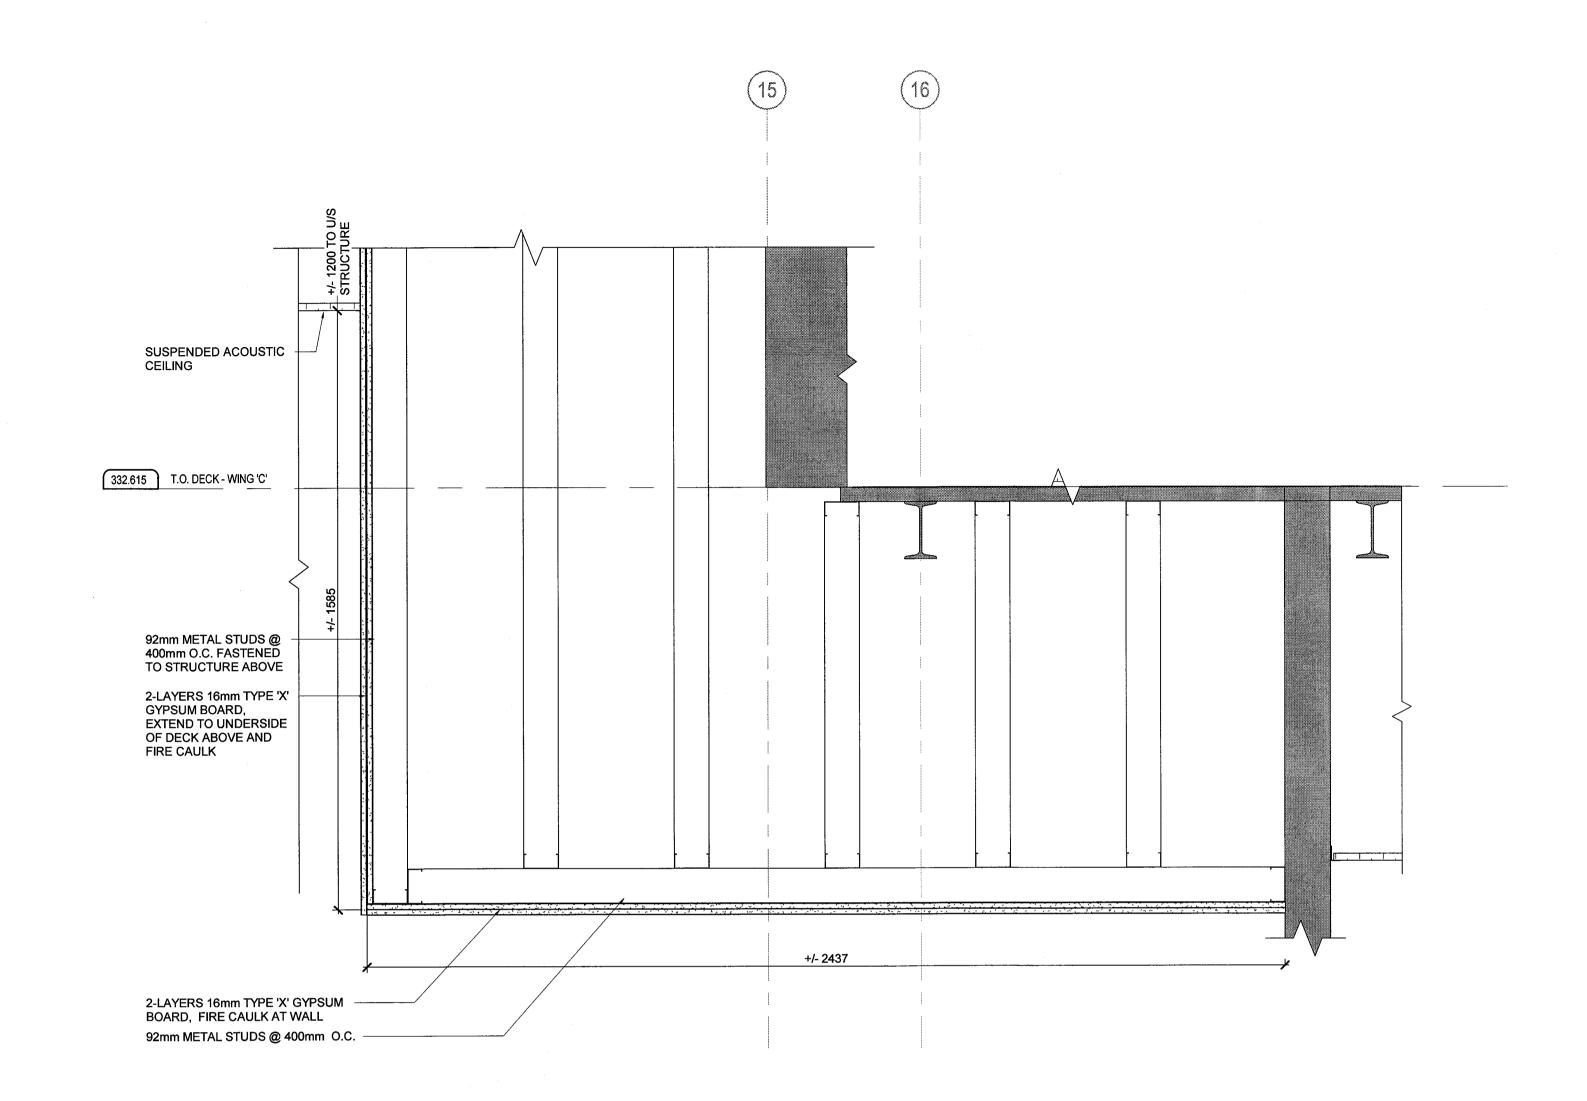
DETAIL - BULKHEAD & LIGHT FIXTURE AT CORRIDOR C104 A59 SCALE: 1:10
